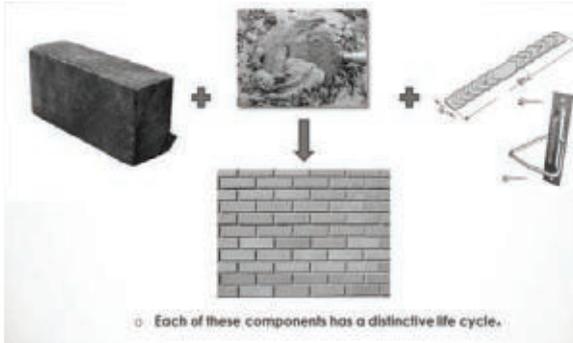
LCA of a brick wall, (Taileb, A & Dekkiche, H (2013).
